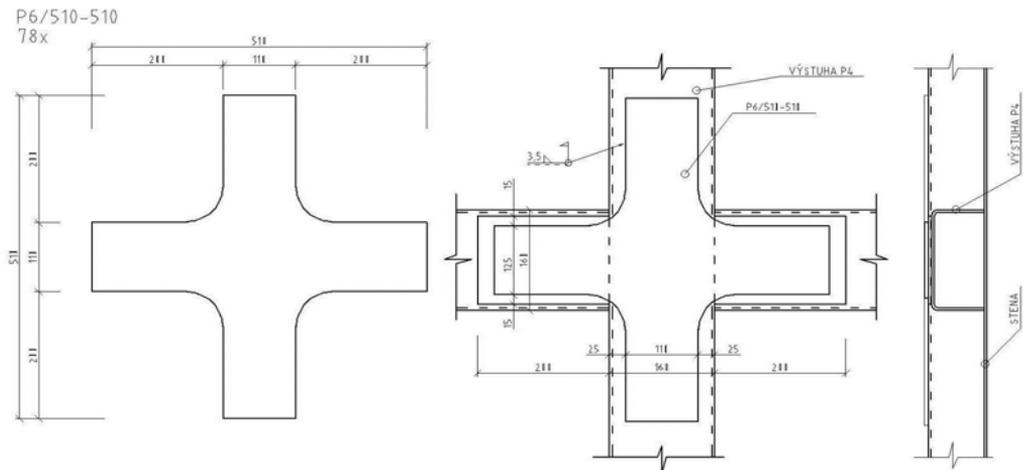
Detail 2 – Strengthening the stiffeners crossing 2 phase [3]
